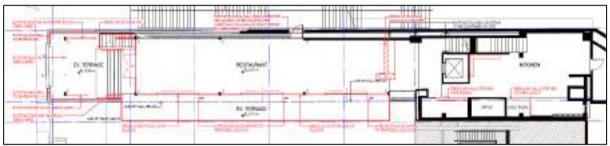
Demolition Plan extract (Source: BJB Architects, 2024)
